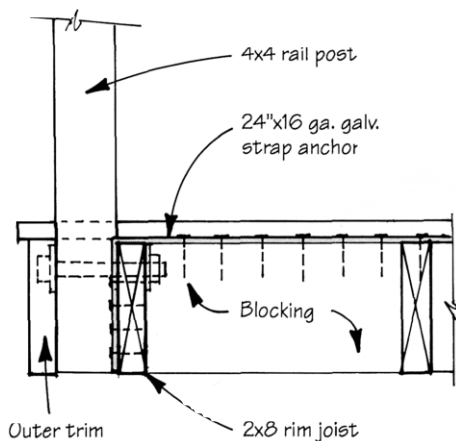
To stop the rim joist from twisting, tie it back to the floor joists with galvanized steel strapping or strap ties. Where the ties run perpendicular to the joists, attach them to solid blocking.
